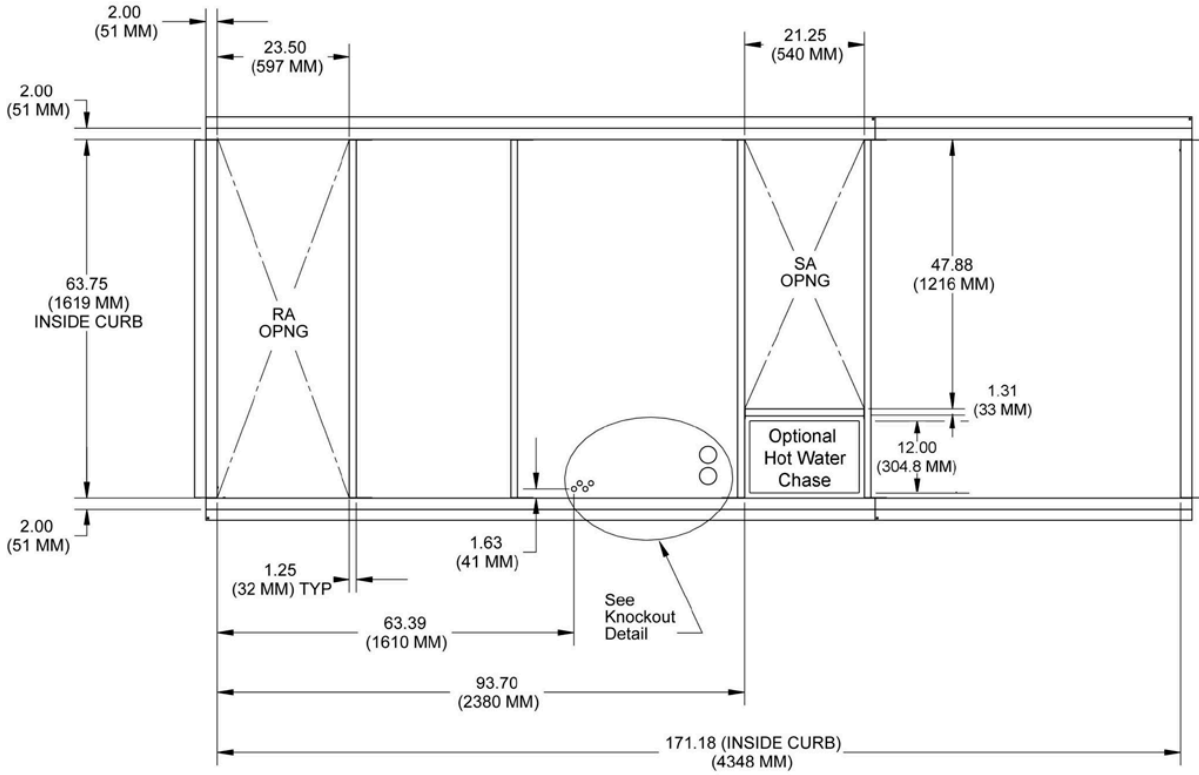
Roof Curb Assembly (MPS 026G – 035F Example)
